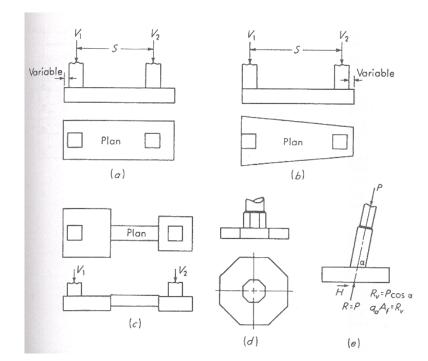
Examples of shallow foundations (a) Combined footing; (b) Combined trapezoidal footing; (c) Cantilever or strap footing; (d) Octagonal footing; (e) Eccentric loaded footing with resultant coincident with area so soil pressure is uniform
